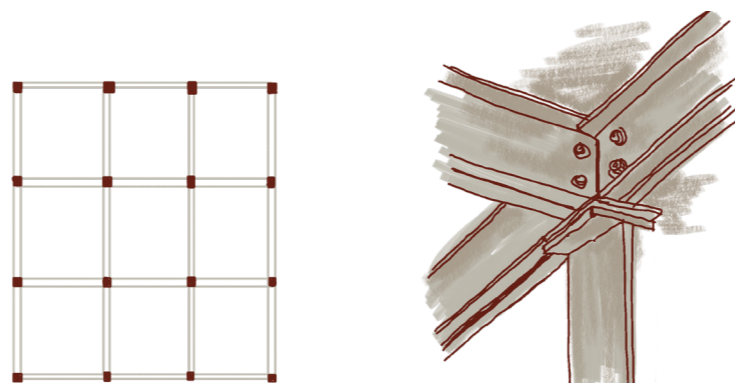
Steel I-beam construction, vertical and horizontal (Author, 2024).
